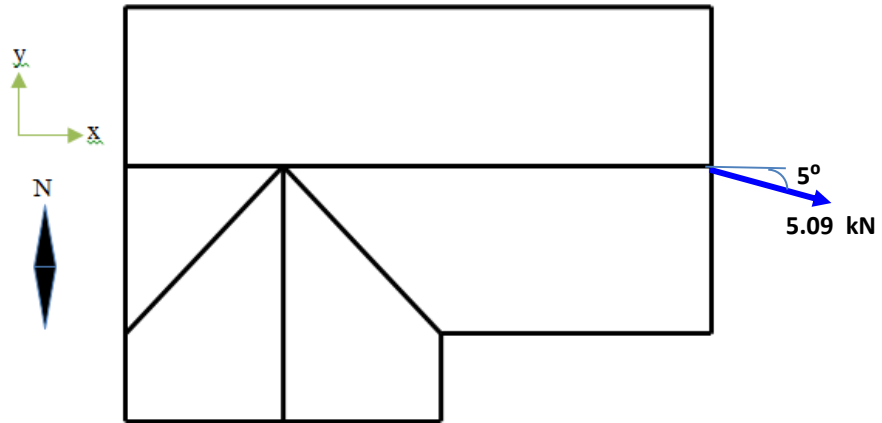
Load Case 13 – 5.09 kN Applied to Roof Ridge of East Gable-End (at -5 degrees)
